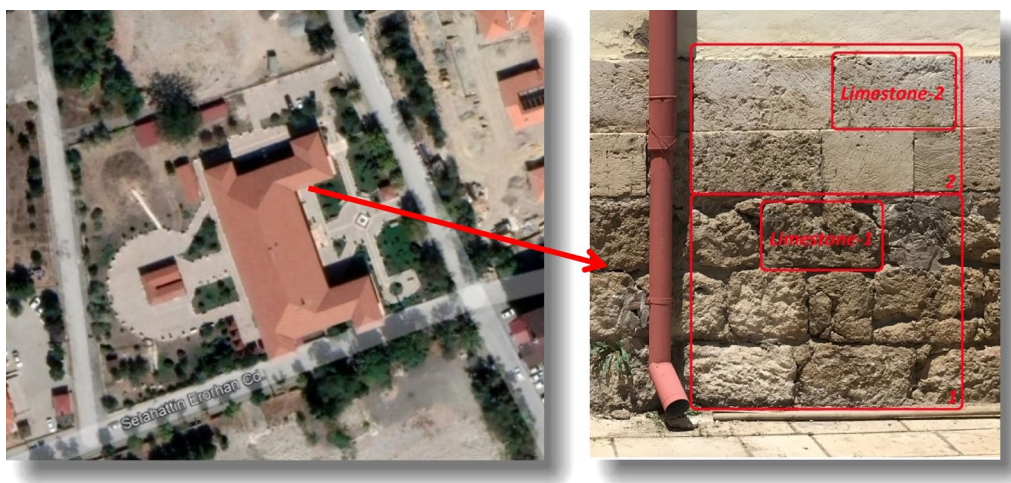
Wall where the Schmidt hammer rebound (SHR) test was performed [18]
